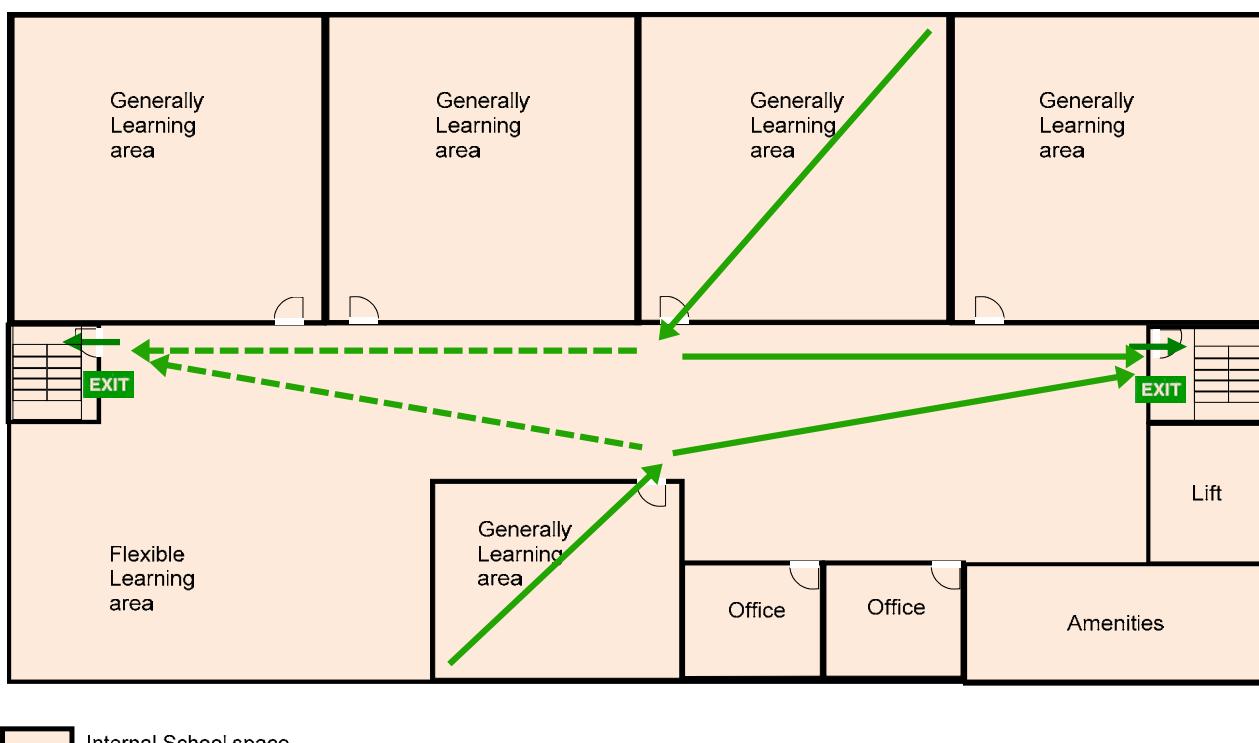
Level 2 to 4 plan of 5-storey Primary School Building
